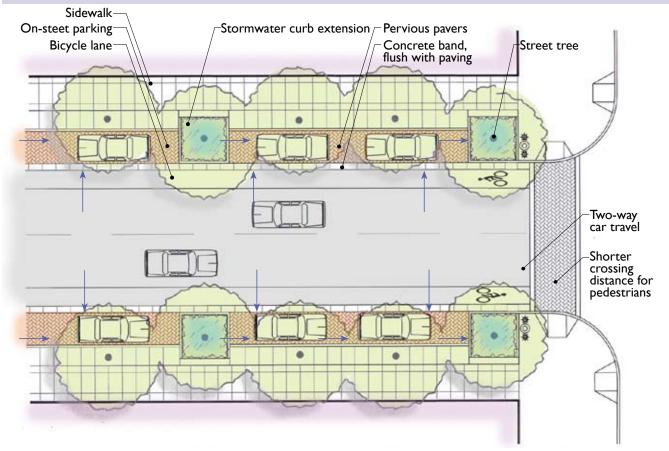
Combination of Pervious Paving and Curb Extensions in Parking Zone-Plan
